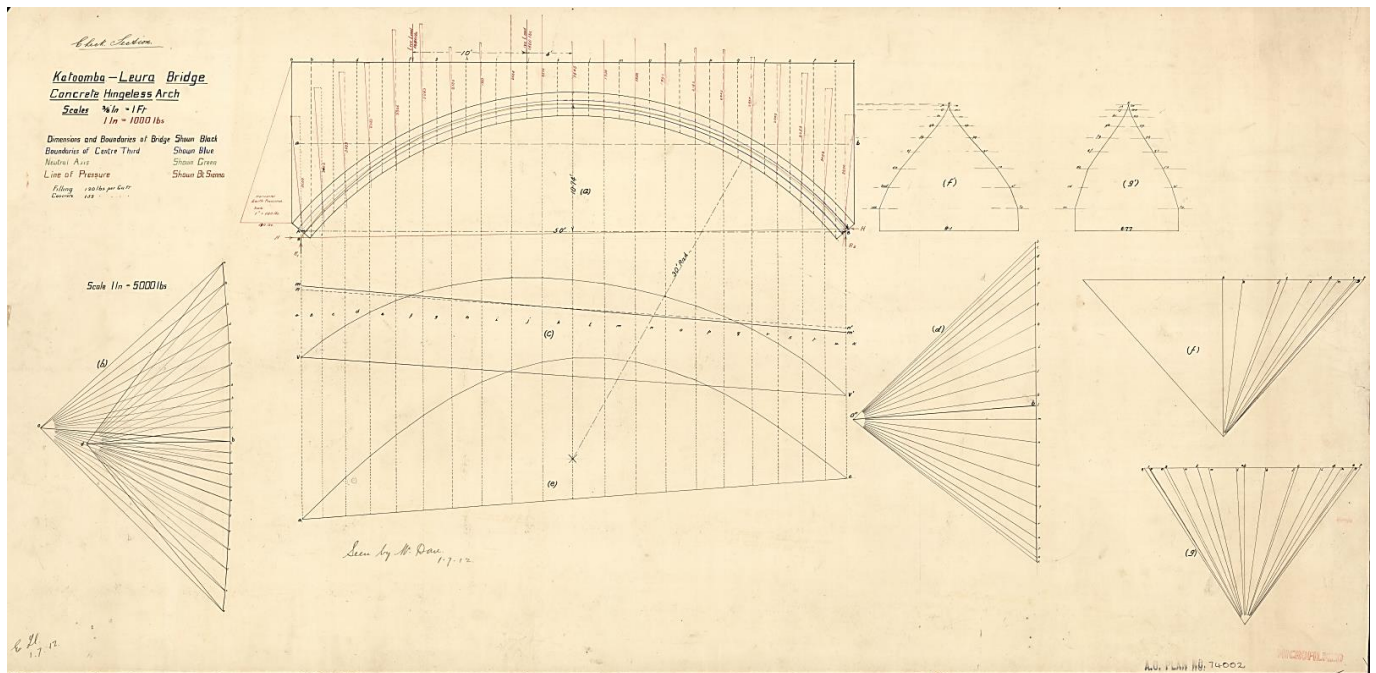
Concrete Hingeless Arch, Load Diagram, Public Works Department 1912. (AO Plan No 74002).
